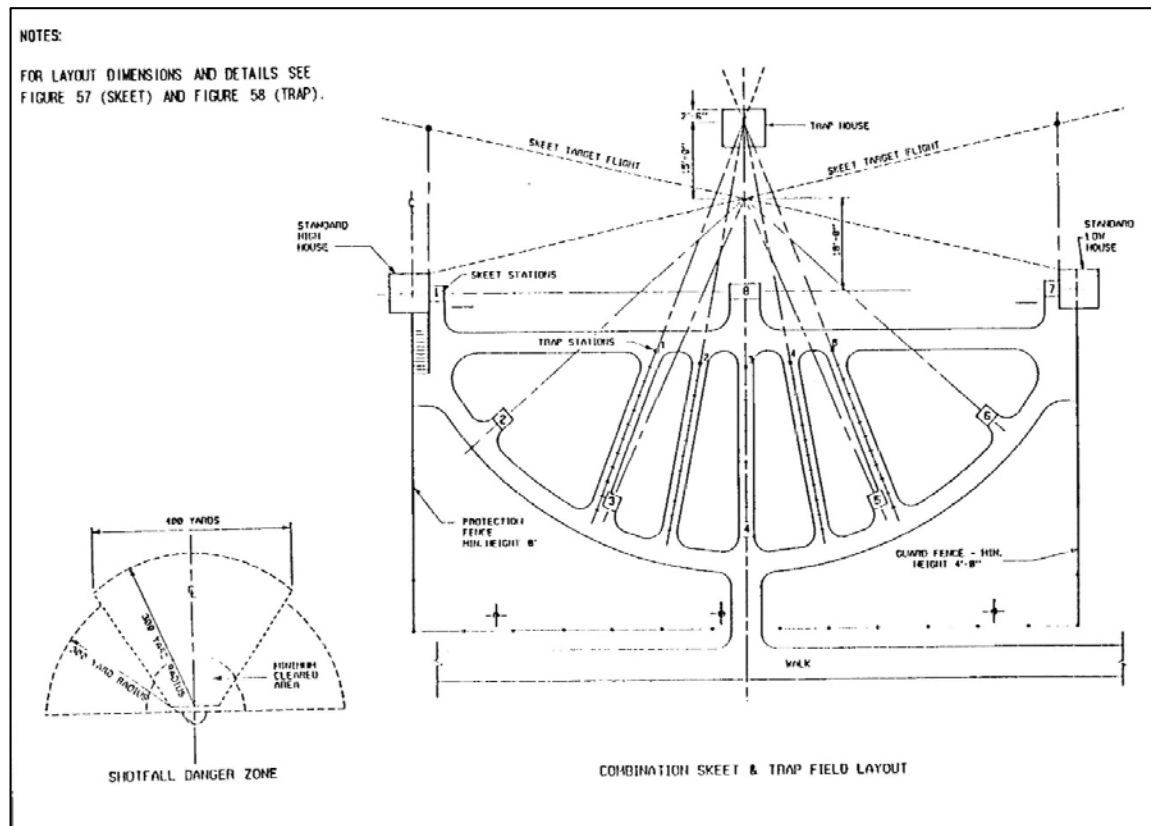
Standard Layout of a Combination Trap and Skeet Range.
